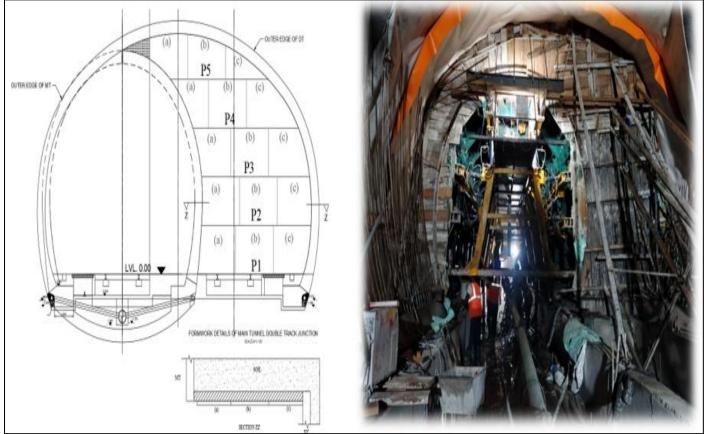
Typical Junction Formwork at MT Tunnel Transitioning from Double Track Tunnel
